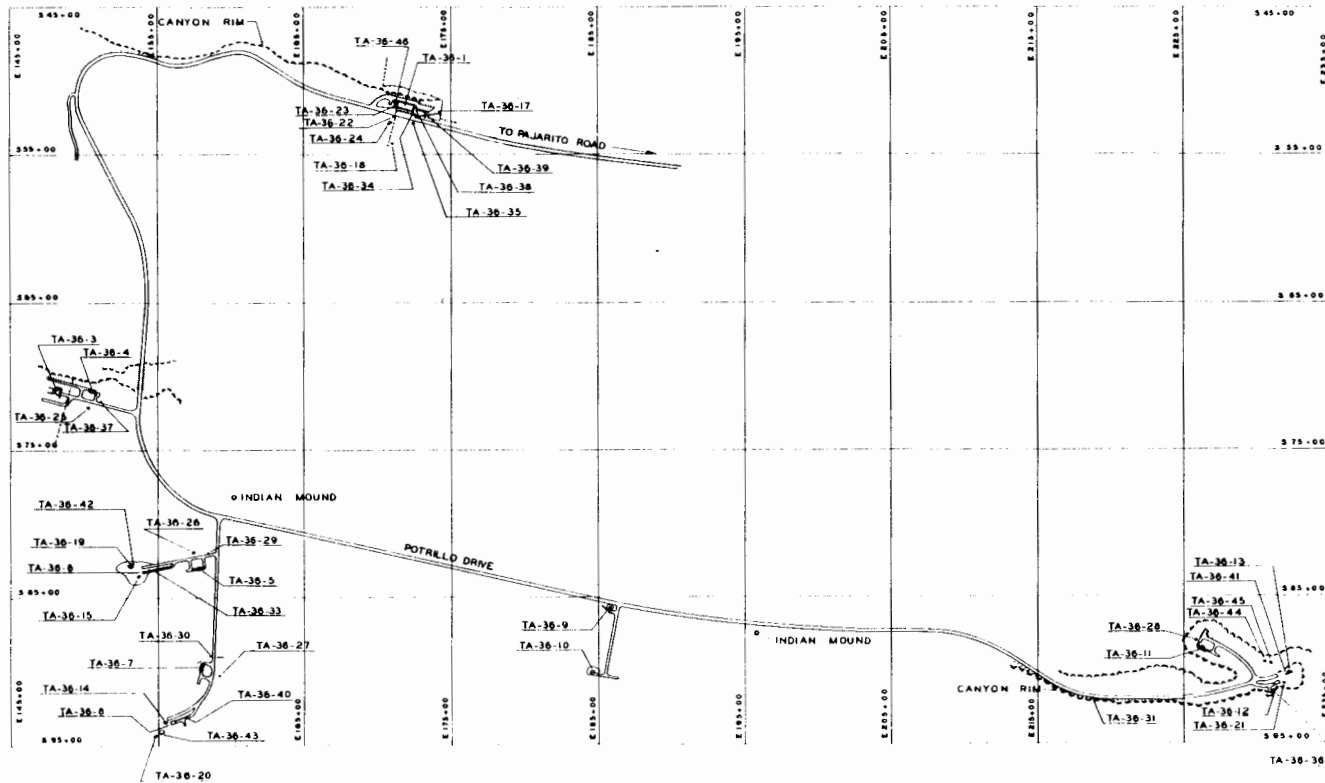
Structure Location Plan for TA-36 - Kappa Site
